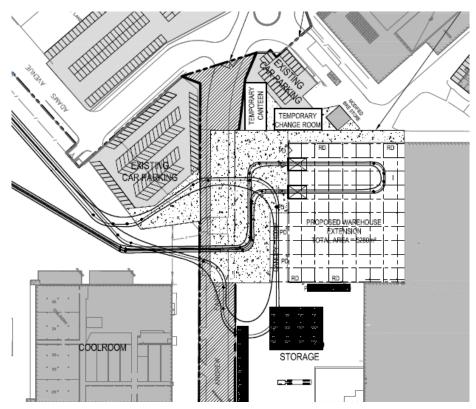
Proposed Andrew Fairley Avenue Closure and Warehouse Extension
